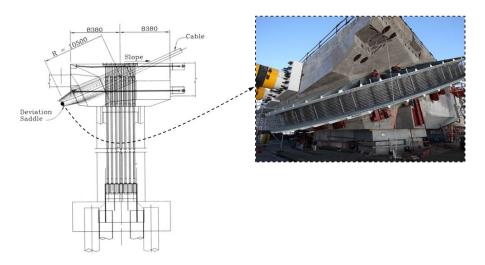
Detail of the saddle on the Oakland Bay Bridge.
